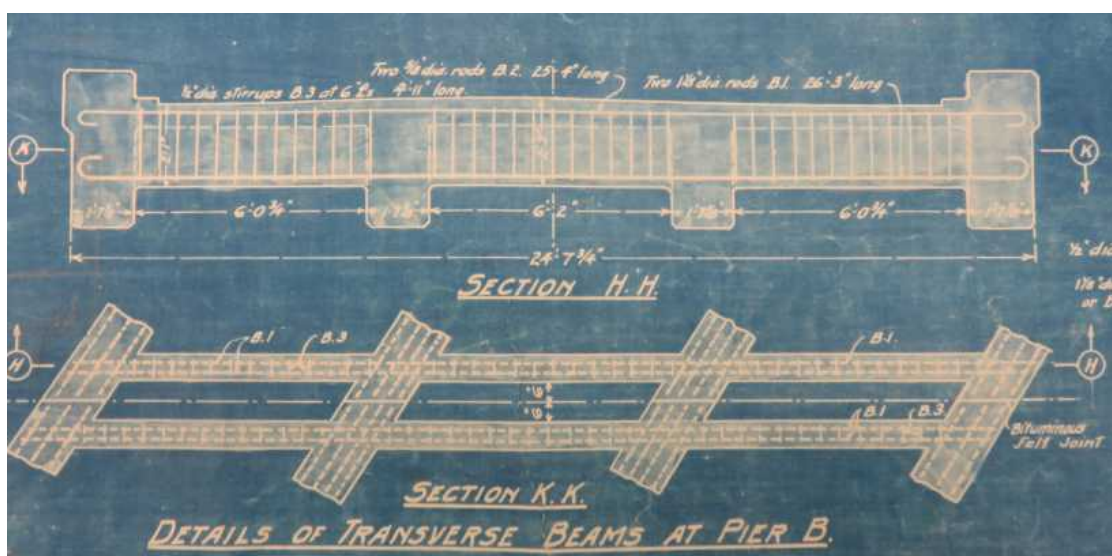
Detail -Mungaroa Stream Bridge (National Archives AAOB W3138 6006)
